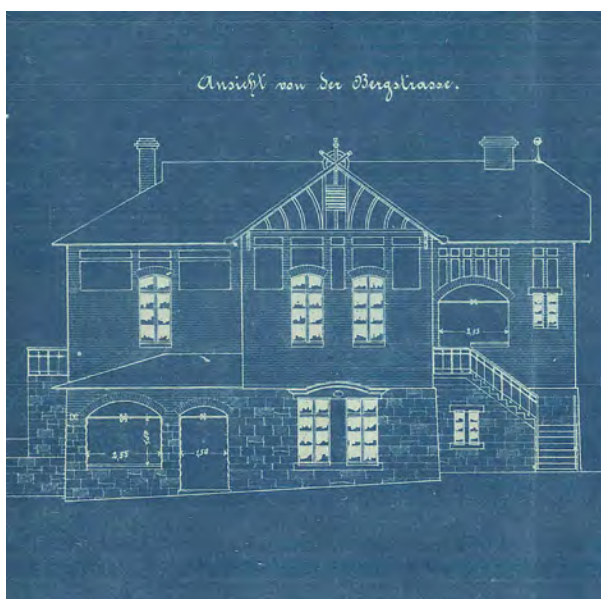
House m West Elevation, July 1909. NAN: Plan No. 1700.
